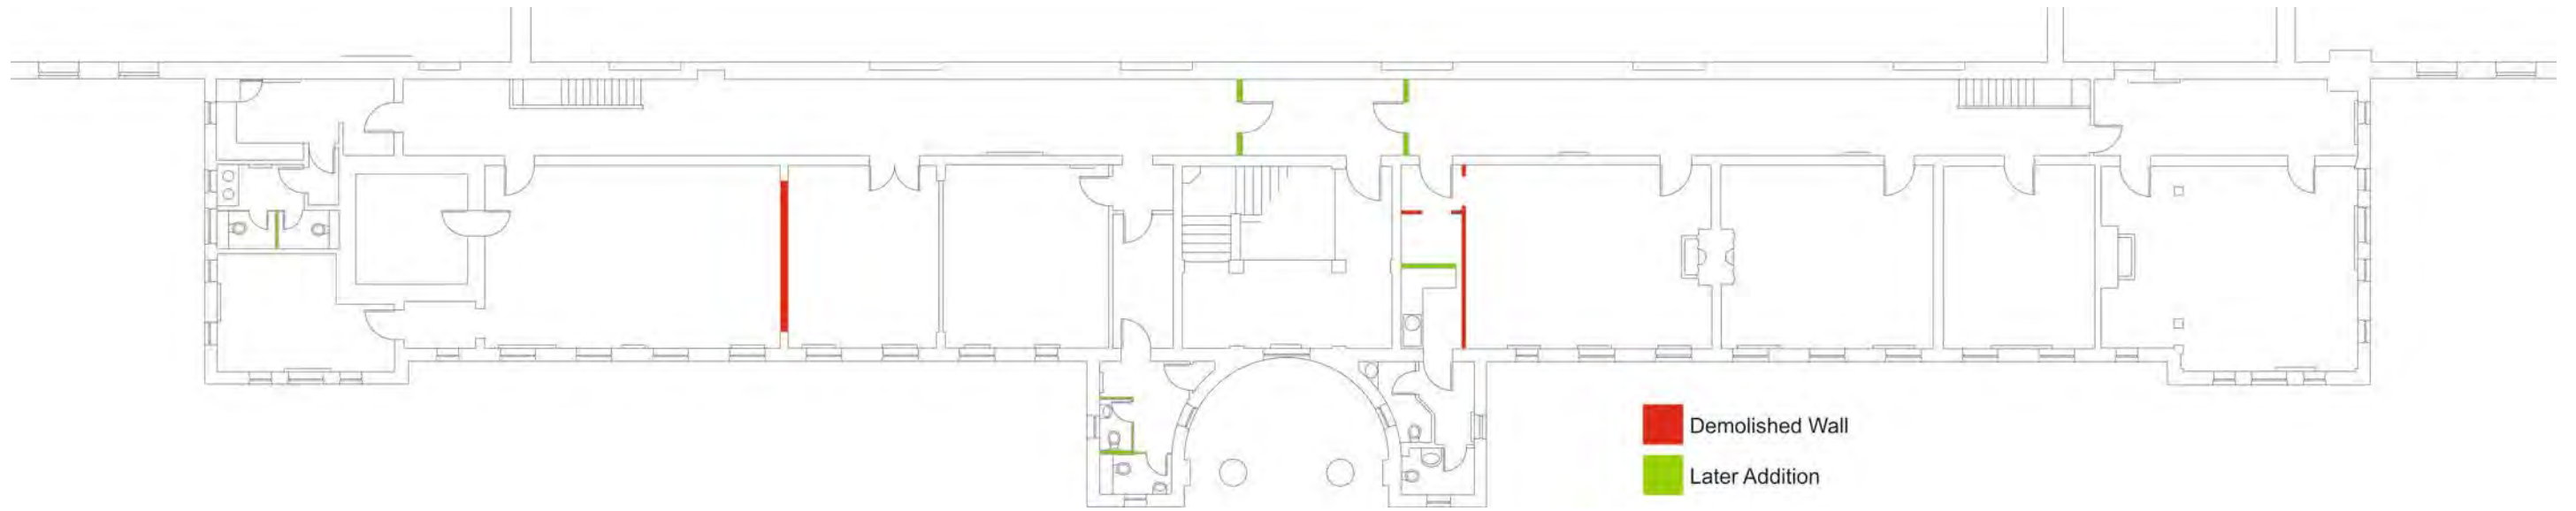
First Floor, Added and Demolished Walls, 1:200 @ A3
